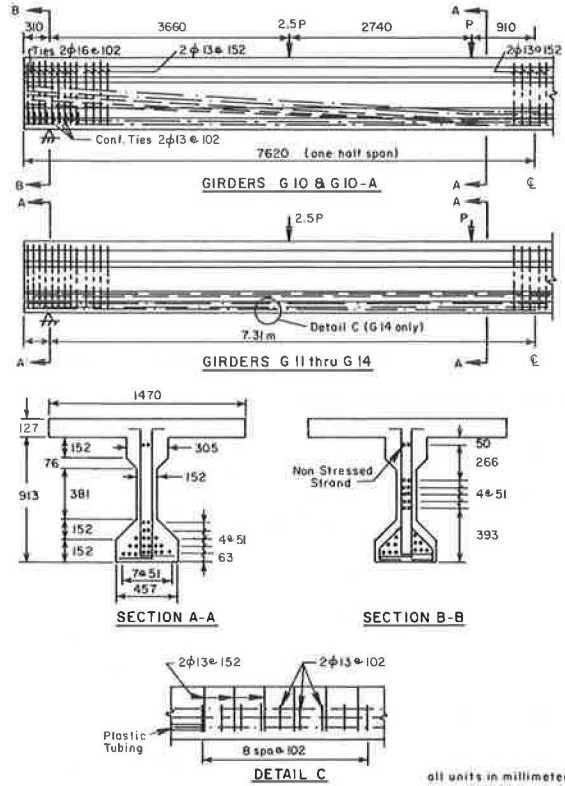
Location of blanketing tubing and crack formers relative to position of loading points.
